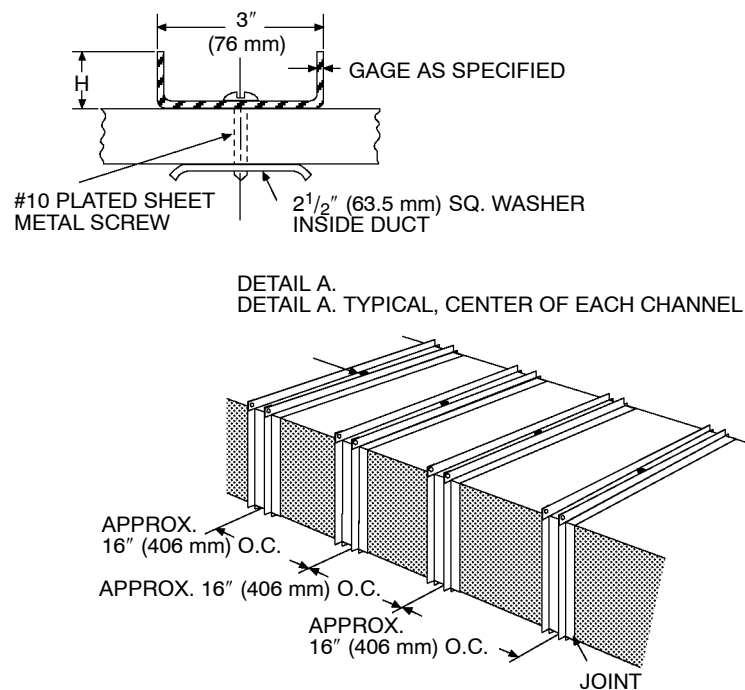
16-INCH (406 mm) CENTERS, 48-INCH (1219 mm) DUCT SECTIONS
